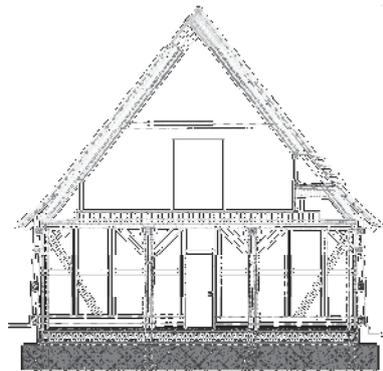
Structural section of the half-timbered building. Denoted B in Table 1.
